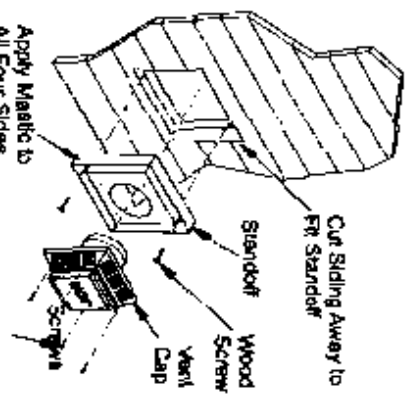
Installing Sliding Standoff (Combustible Exterior Wall)
